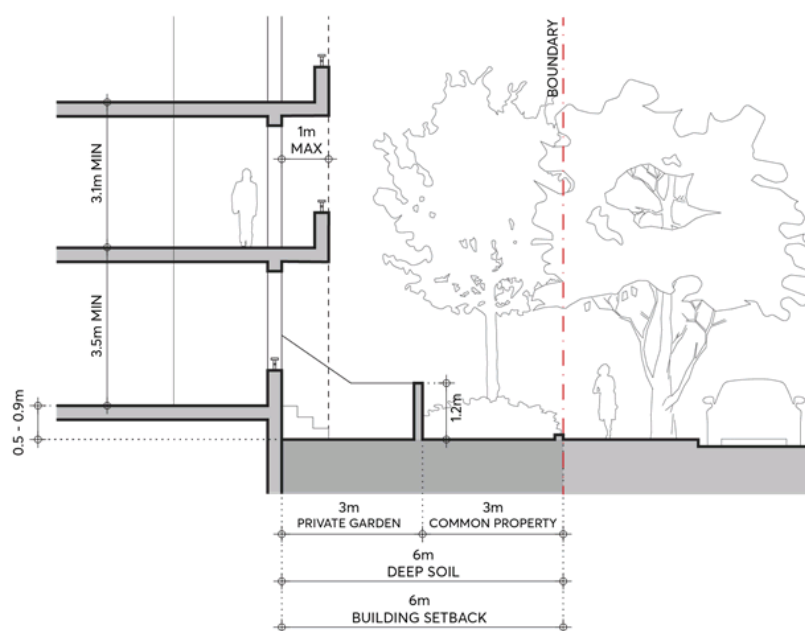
Ground floor interface and floor to floor heights
